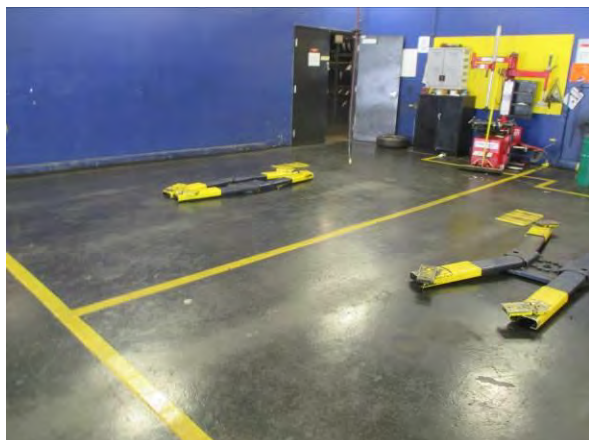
Typical view of the in-ground hydraulic lifts located in automotive service center.
